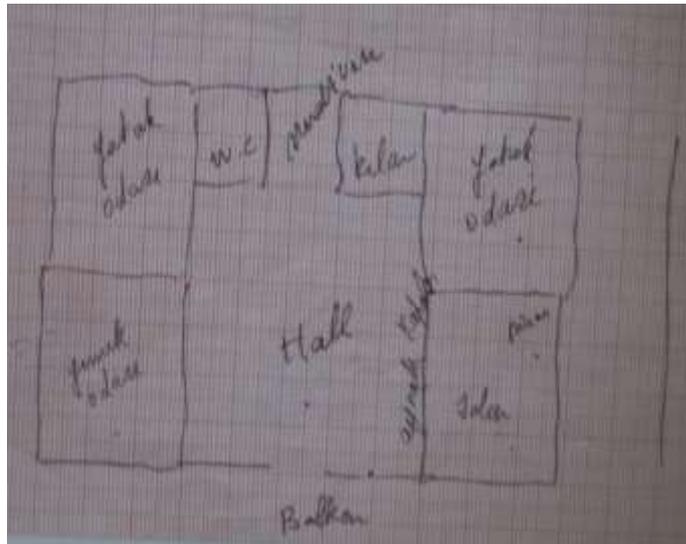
Sketch showing an old plan layout of the entrance floor, it is not consistent with contemporary usage.
